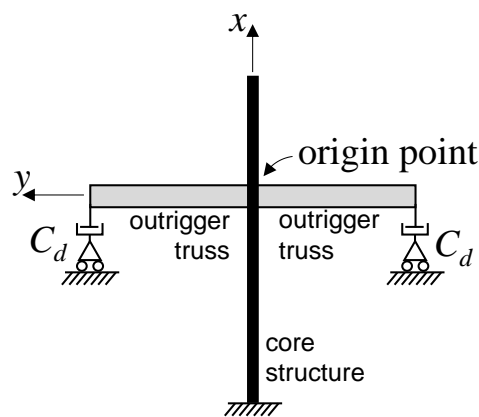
Cantilever column with damped outriggers (Chen *et al.*, 2010)
